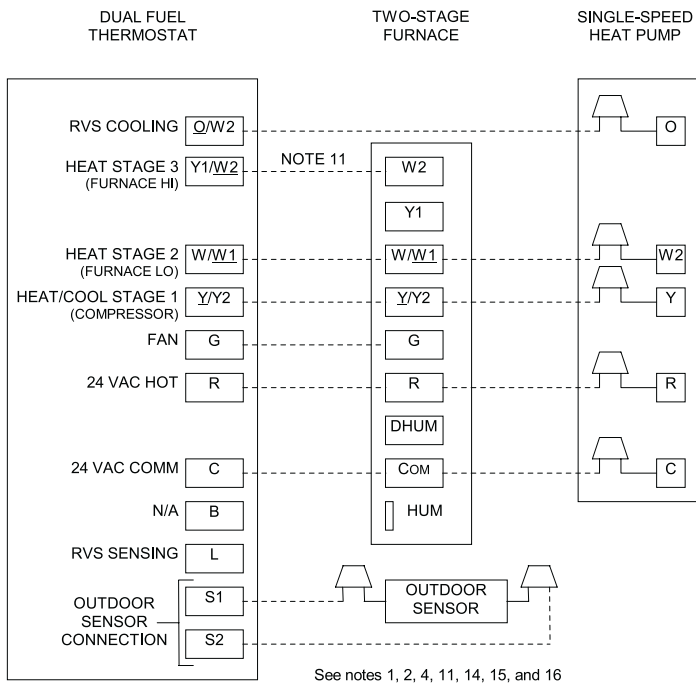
Dual Fuel Thermostat with Two-Stage Furnace and Single-Speed Heat Pump
